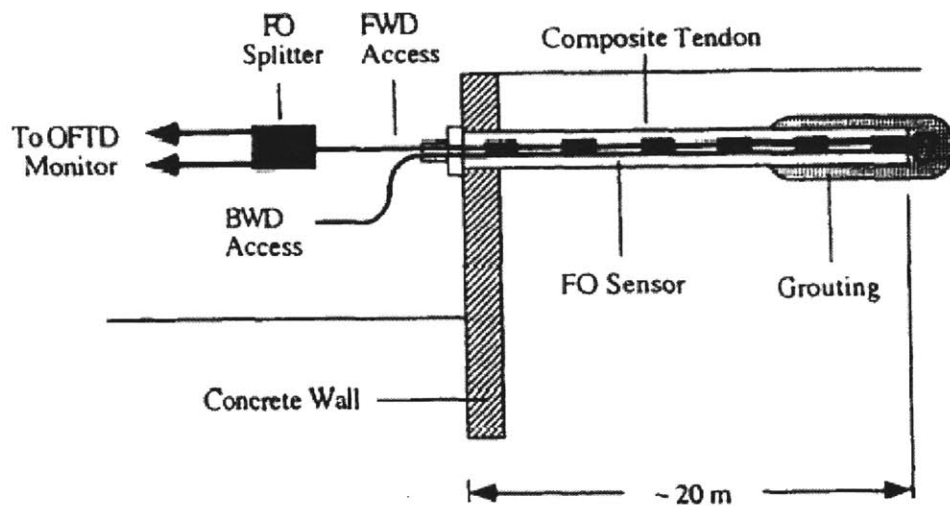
Distributed sensor for concrete wall anchoring system (Zimmermann & Claus, 1993)
